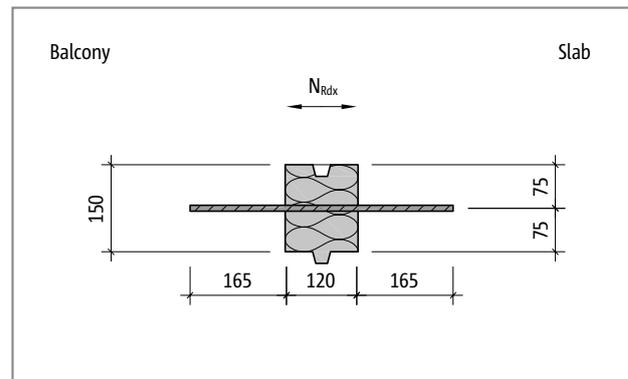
Schöck Isokorb® XT type H-NN1: Product plan view
